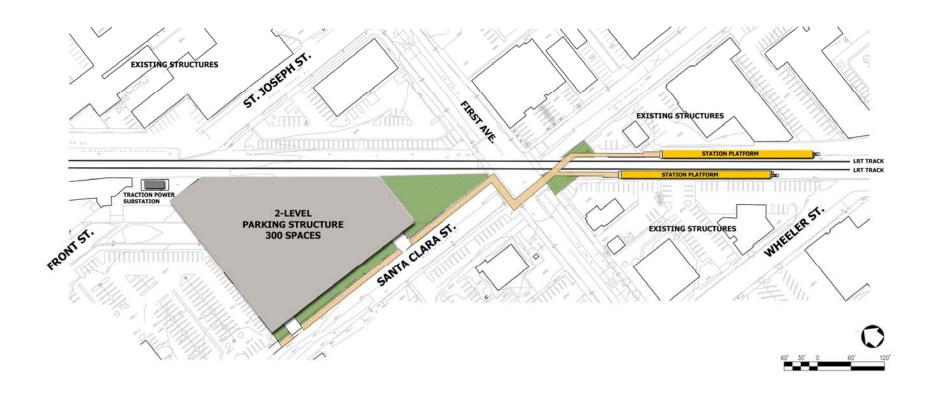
Site Plan: City of Arcadia Station, Option A
